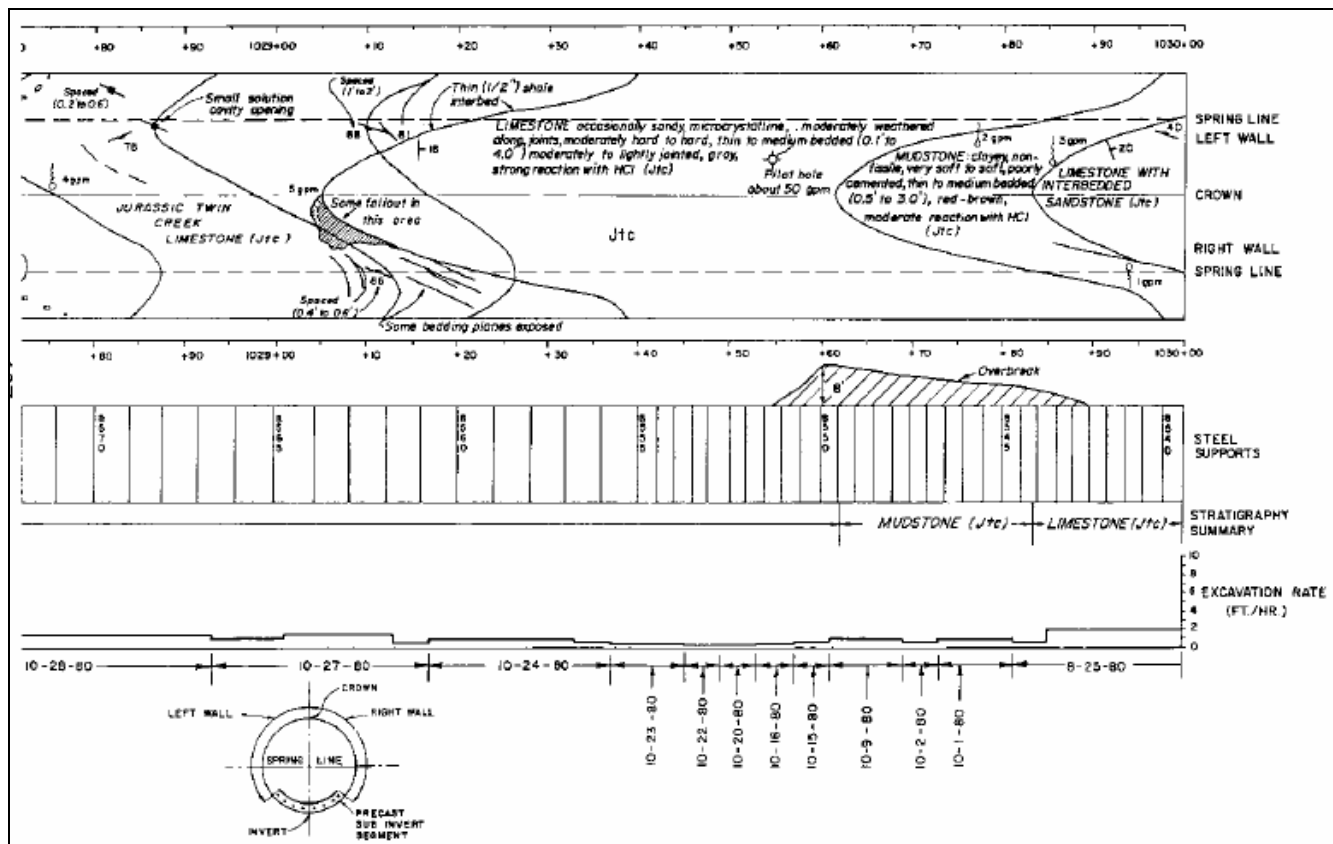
Example of tunnel mapping from machine excavated tunnel.
